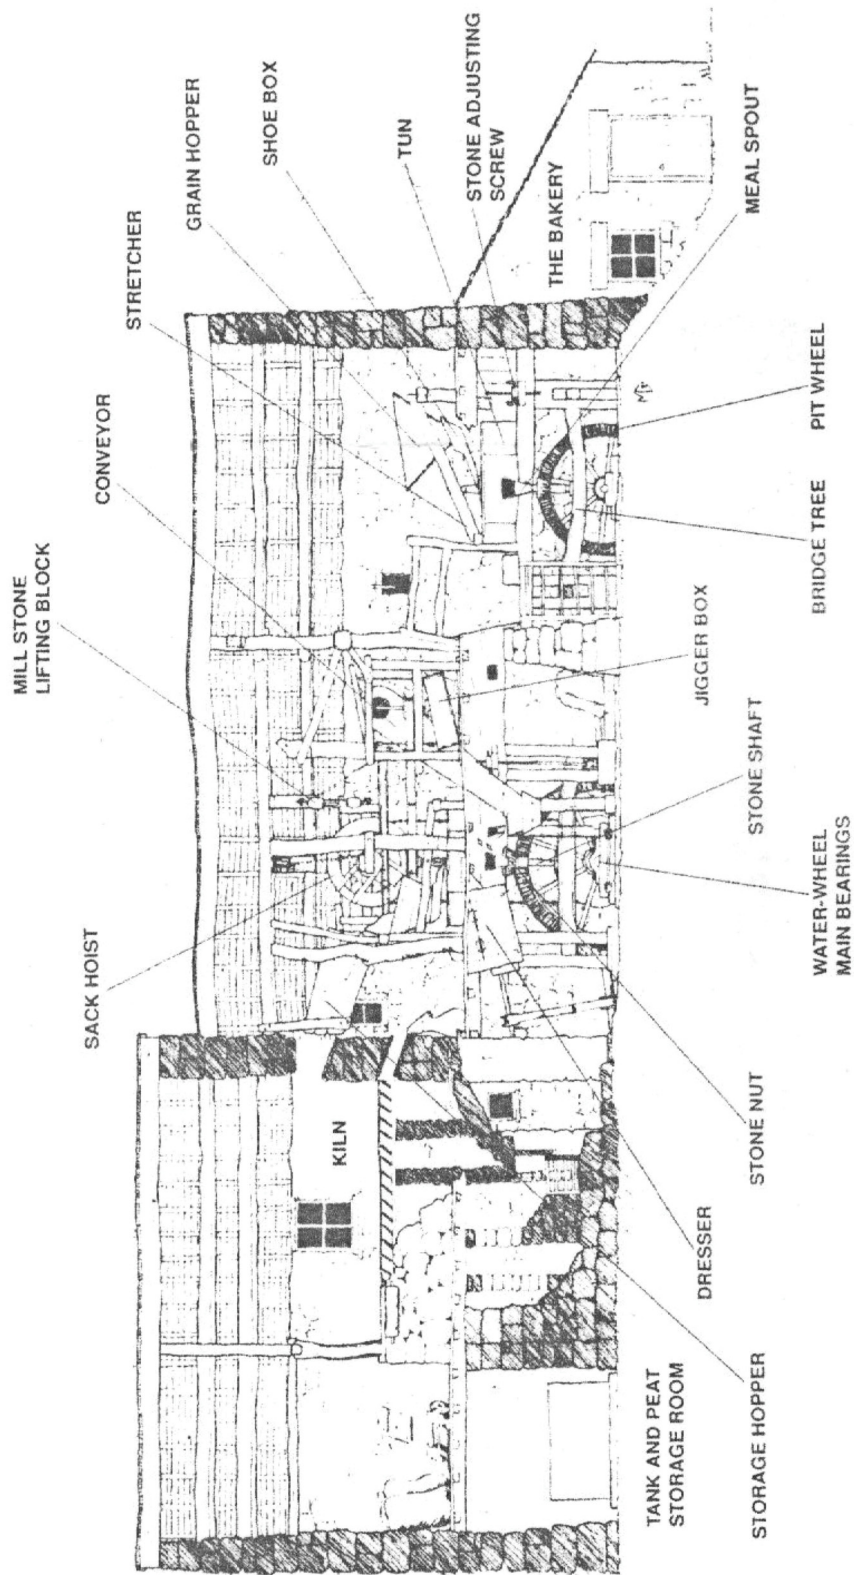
Eskdale Mill, Boot, sketch section looking east showing machinery nomenclature, floor heights, and roof detail. Drawing with permission from David King, Eskdale Mill and Heritage Trust
